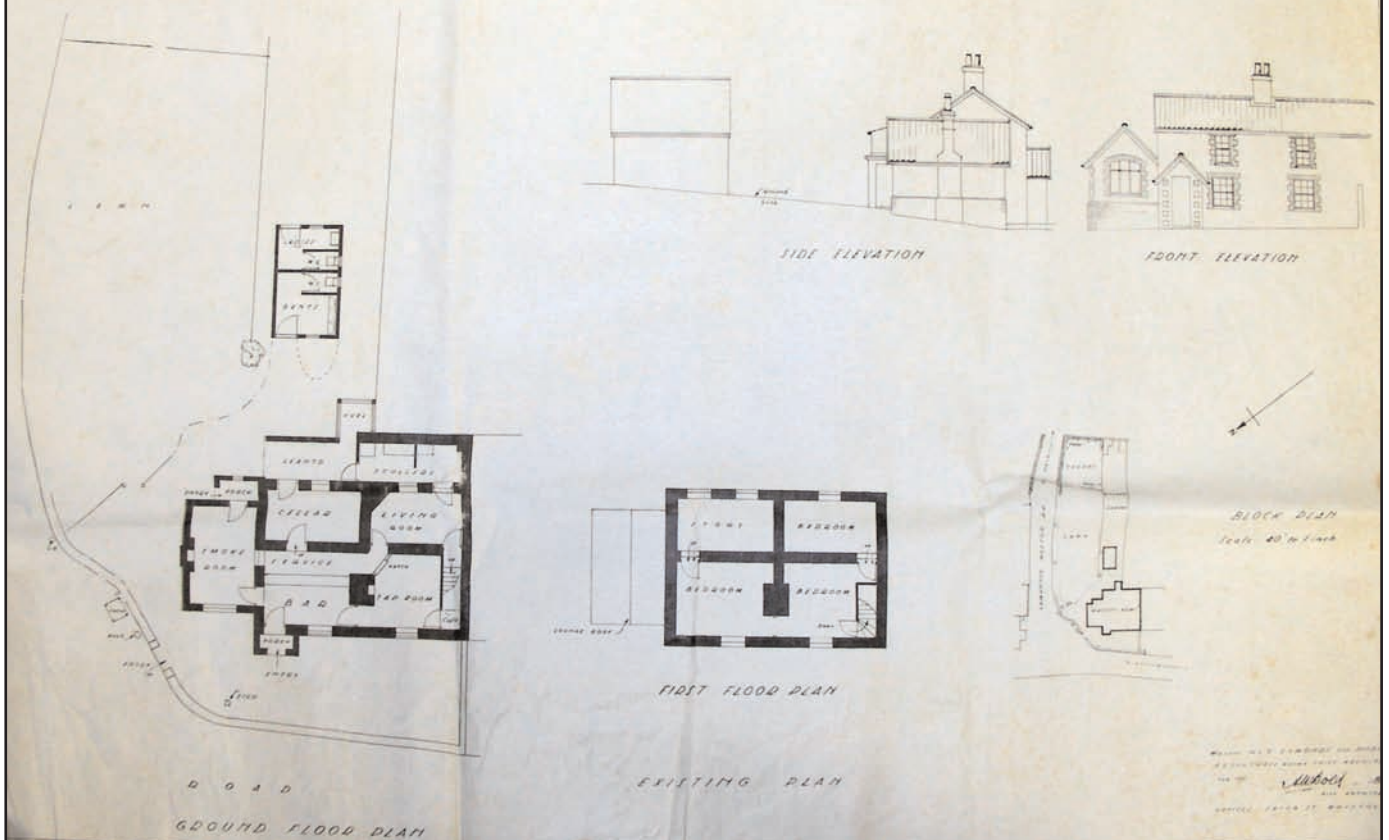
Architectural drawing depicting existing plans and elevations of the Masons Arms prior to alteration, dated 1951 (BCC)
